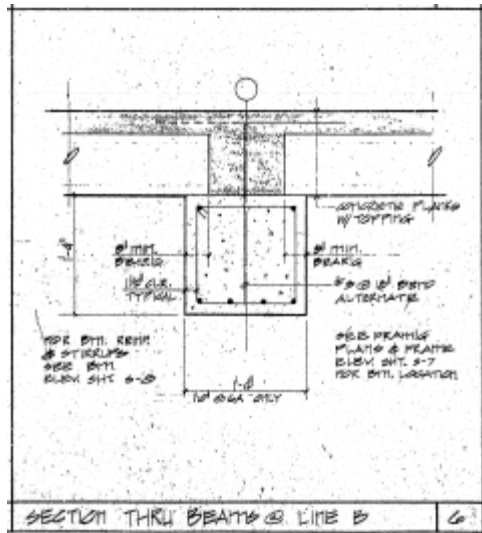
Topping Slab to Pre-Cast Beam Connection
